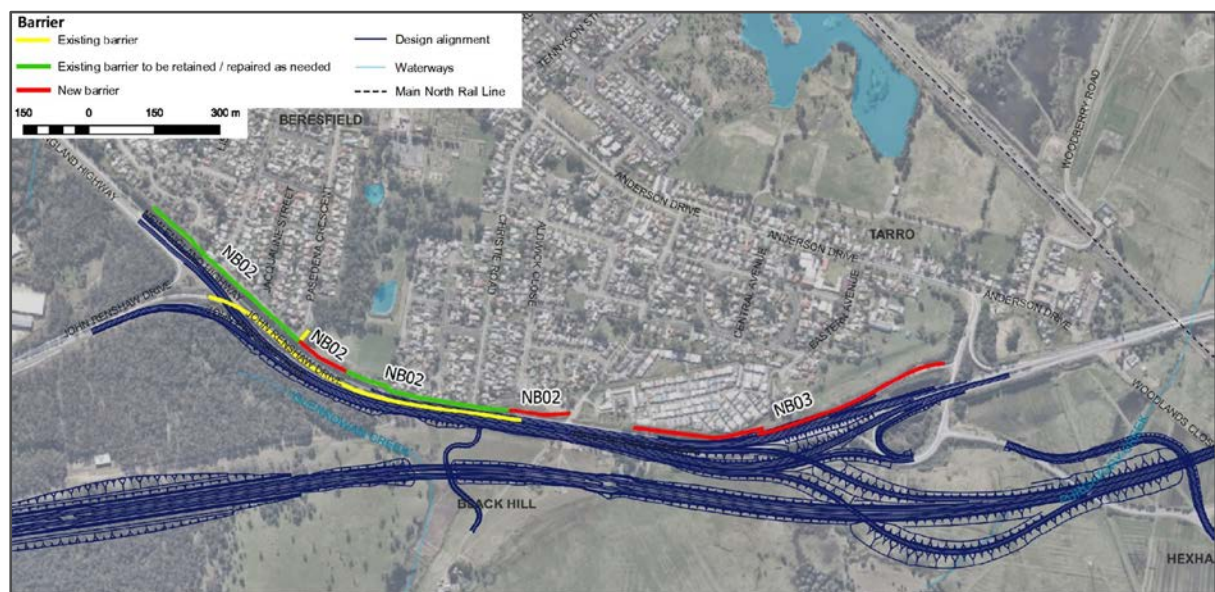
| Existing and proposed noise barriers in Tarro (Source: RtS)
